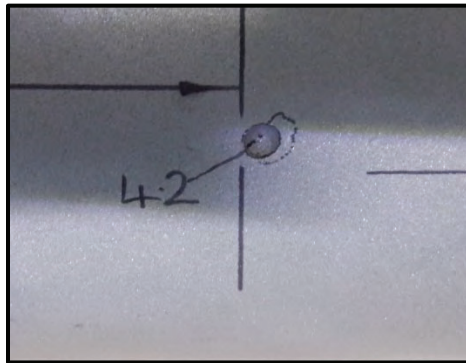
Typical external corrosion example: pitting corrosion.
